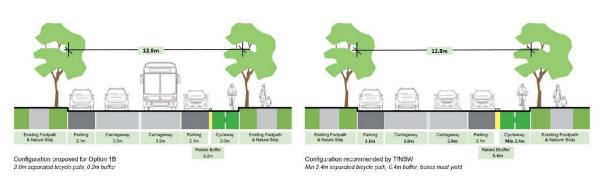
Configuration proposed for Option 1B, adjusted to meet TfNSW's recommended lane widths (Source: Northern Beaches Council)
